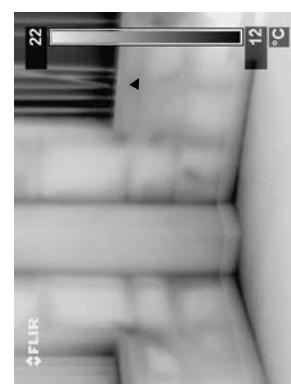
Air leakage noted at the bottom corners of the curtain wall assembly (building under positive pressure).
